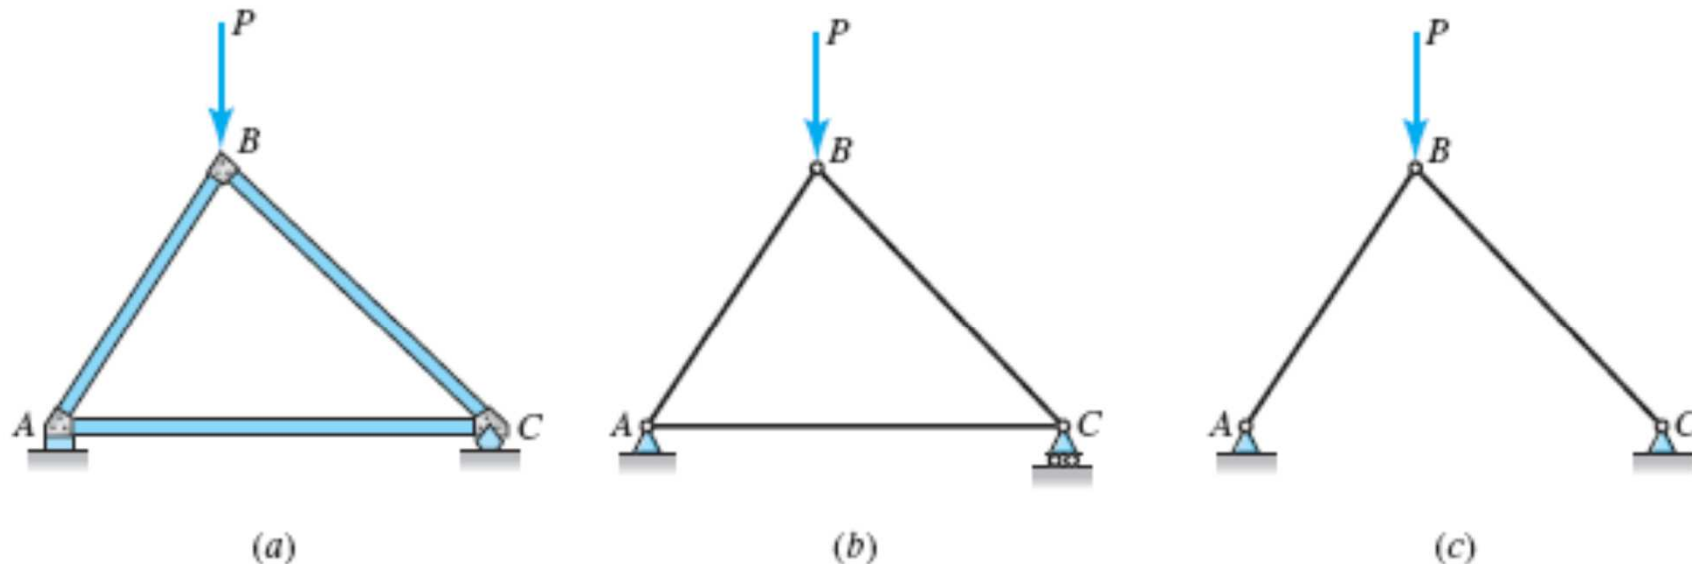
Basic truss with a load at joint B : (a) triangular and (b) its idealized model; (c) two-bar.
